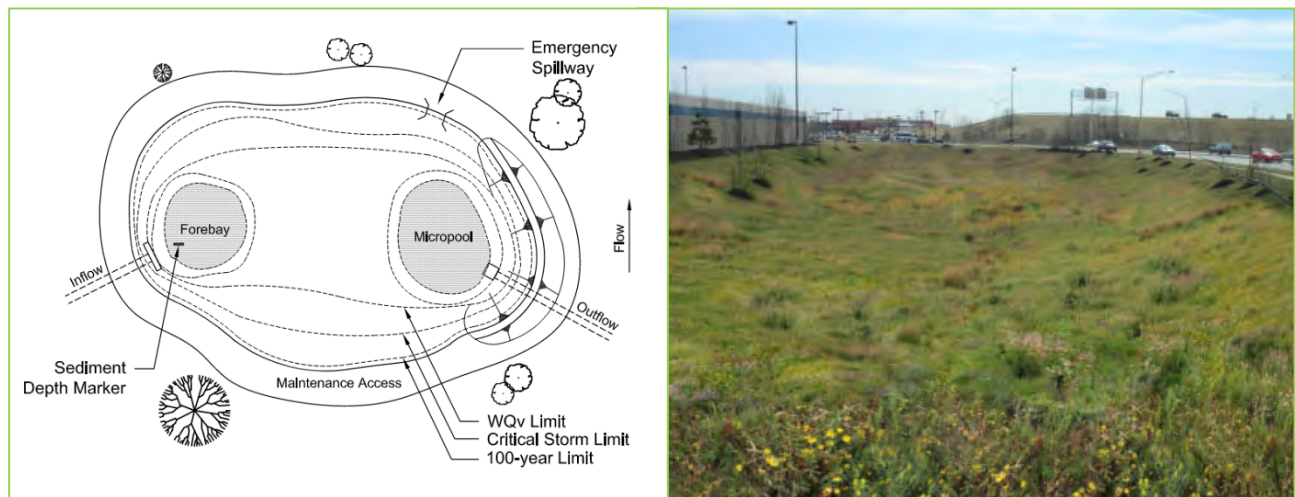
PLAN VIEW OF DRY DETENTION BASIN DESIGN (LEFT) AND TYPICAL DRY DETENTION POND (RIGHT)
